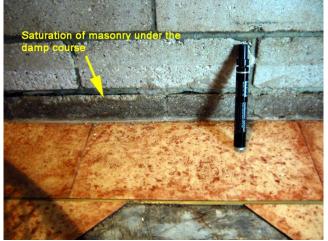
This schematic shows an example of a below grade slab and how moisture can travel into the concrete. The picture below shows an example of a below grade slab.
